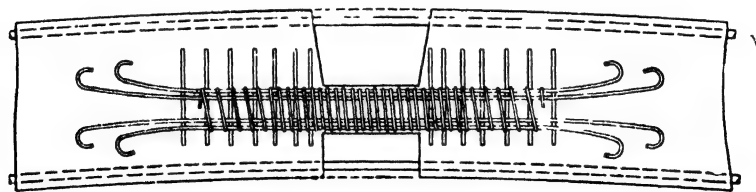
Longitudinal Section through Temporary Hinge, showing Arrangement of Reinforcement.
